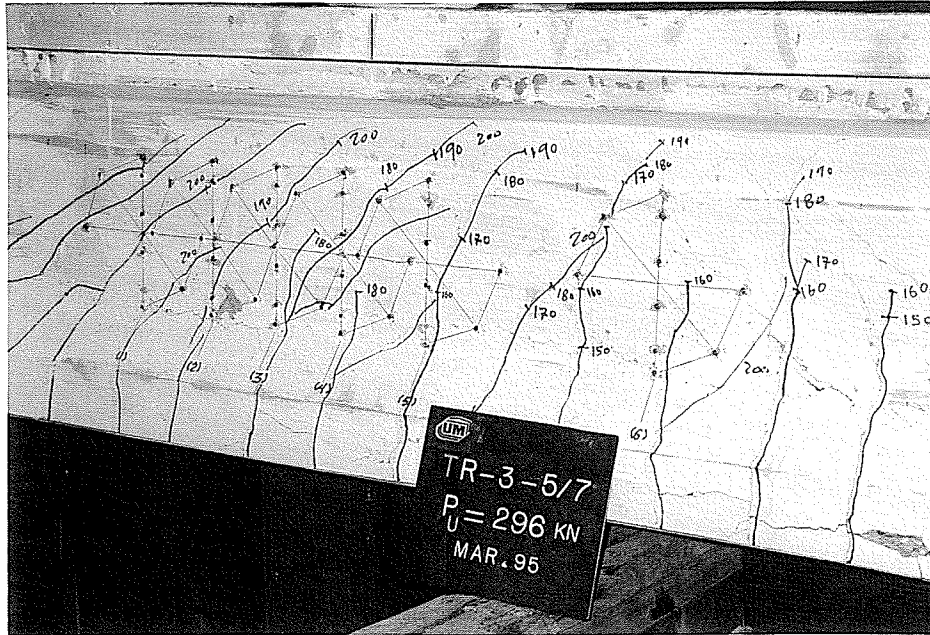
(c) Diagonal crack pattern of beam TR-3-5/7
